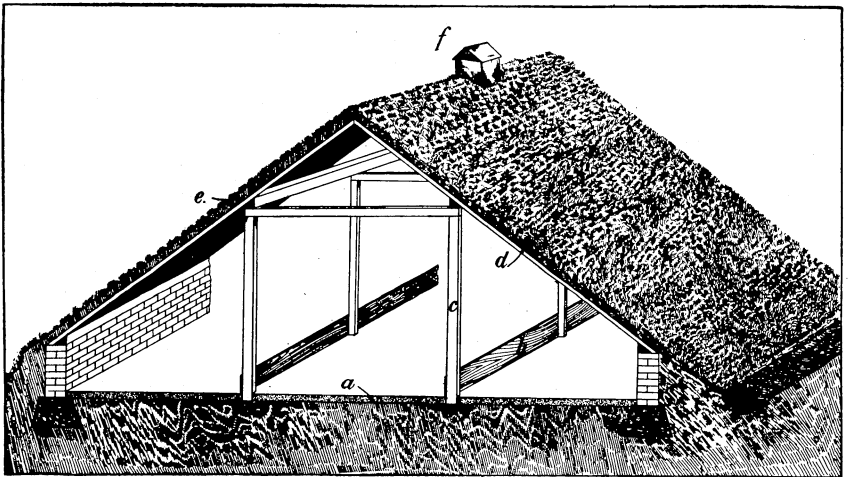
Cross section of celery storage house—width 24 feet, height of side walls 2 feet, and height in center to ridge 11 feet: *a*, bed of sand on earth floor; *b*, division boards through house; *c*, posts supporting roof; *d*, roof planks; *e*, sod, straw, or manure for frost proofing on roof; *f*, ventilator.
